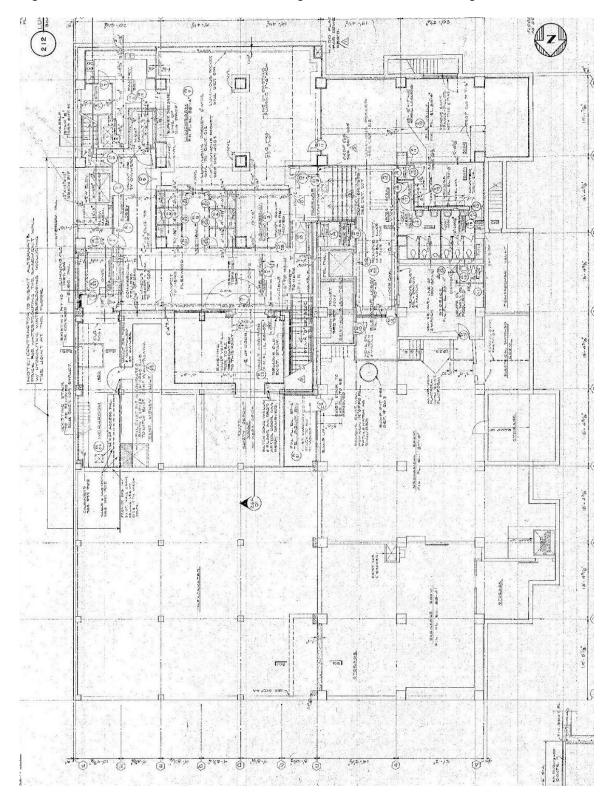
First Wichita National Bank Building First Floor Plan (George Dahl Architects 1960).
